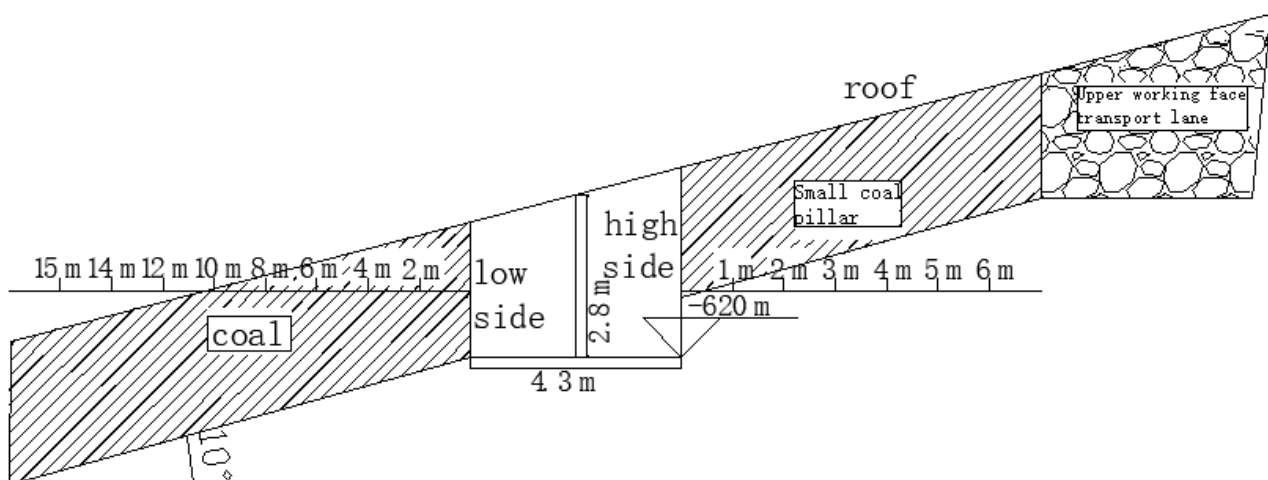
11318 Schematic diagram of section layout of measuring station.
